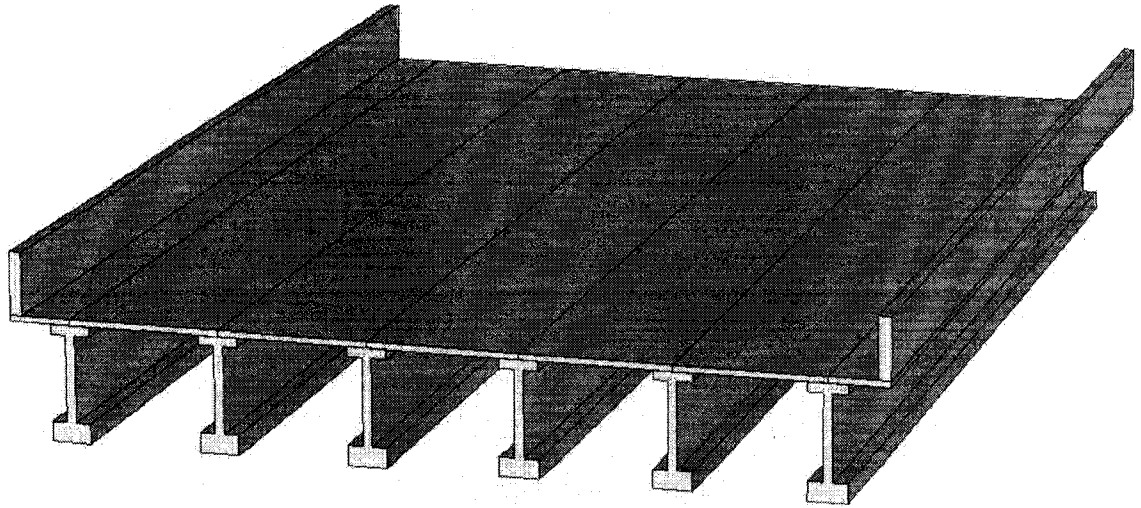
Solid Model of *PC* Bridge Girder Structural Numerical Examples.
